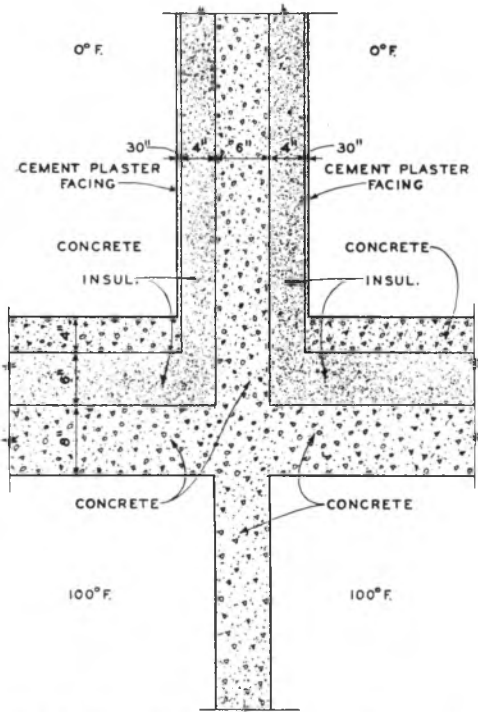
CROSS SECTION OF BUILDING STRUCTURE
